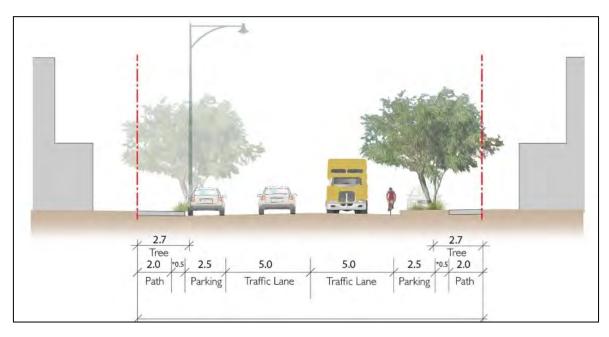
Proposed Road Reservation Width and Cross-Section for the Local Roads
